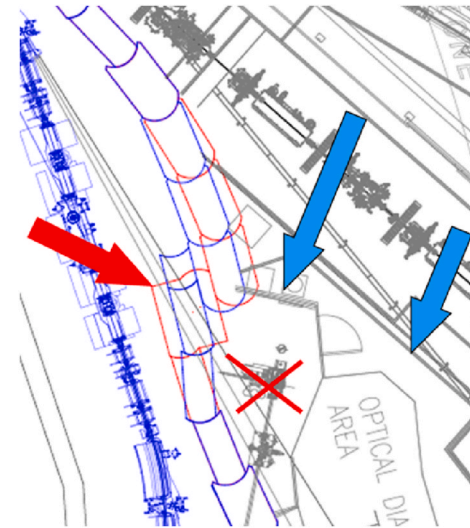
Outer wall reconfiguration for beam-exit 12.1.
